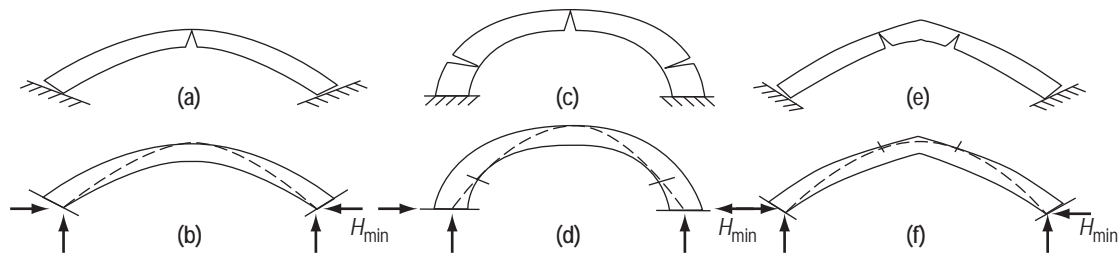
Masonry arches showing hinge formation where forces flow outside the arch boundary.
